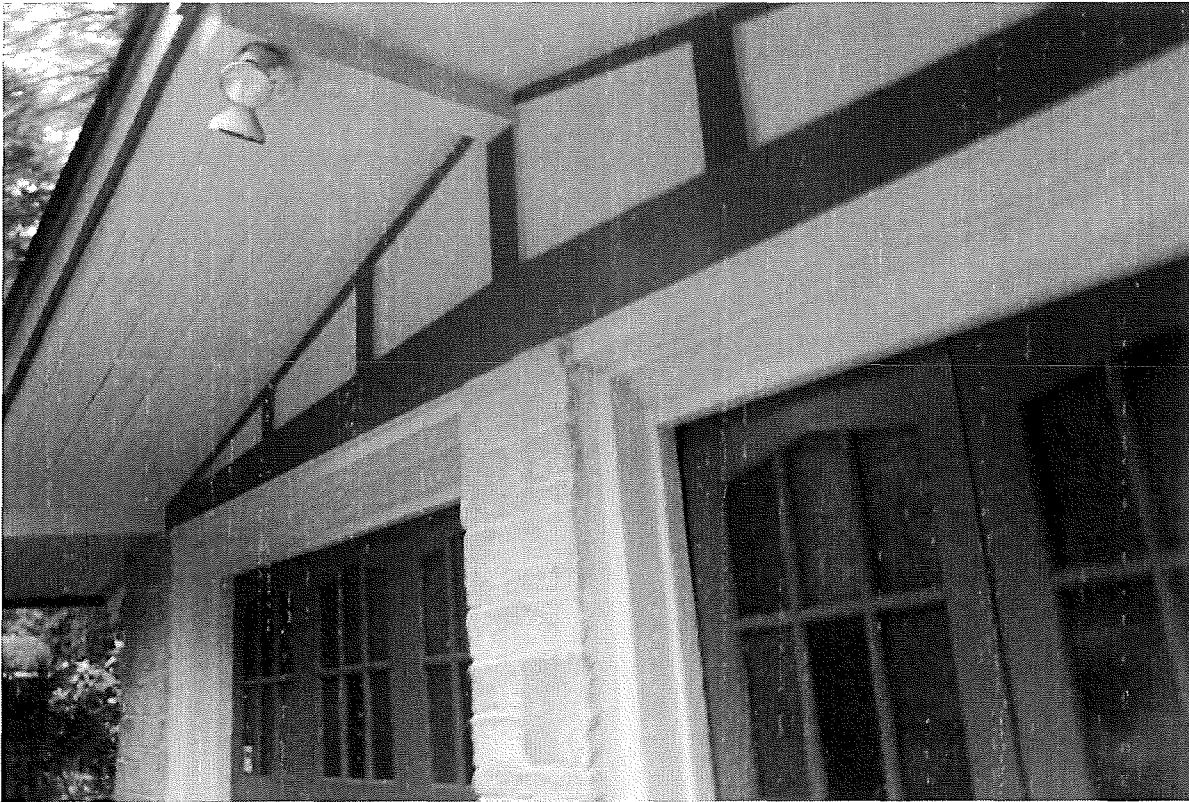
Front Elevation - Original Brick (October 20, 2020)
